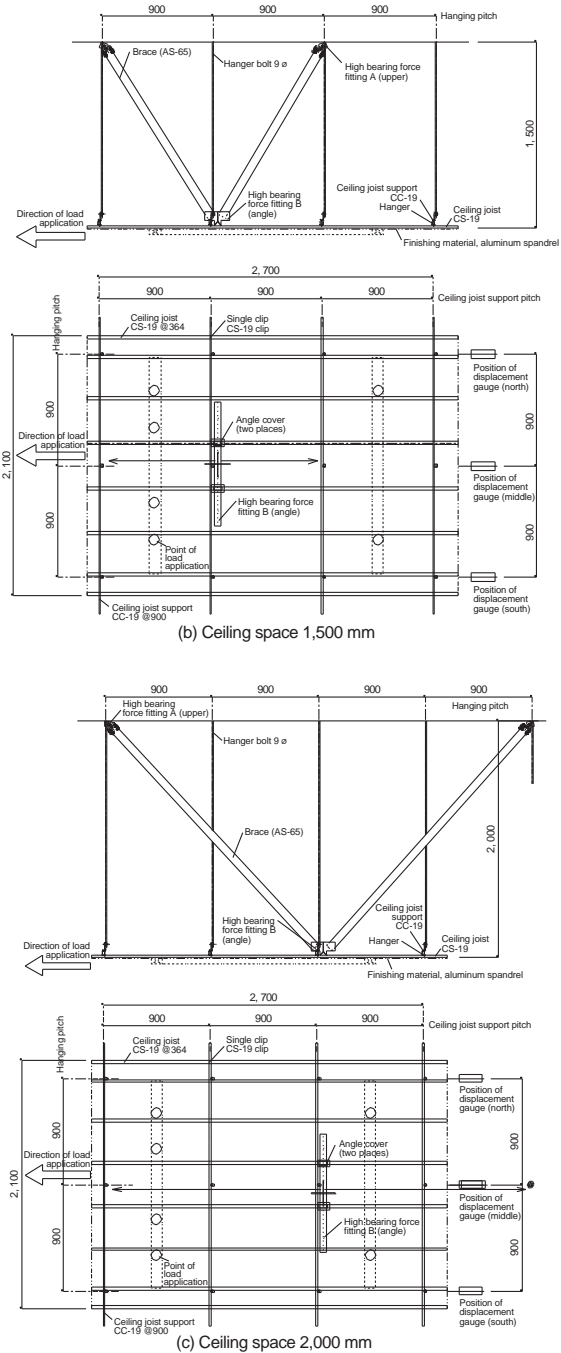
Schematic of Specimen for Test 1 (Load Applied in Direction of Ceiling Joist)
